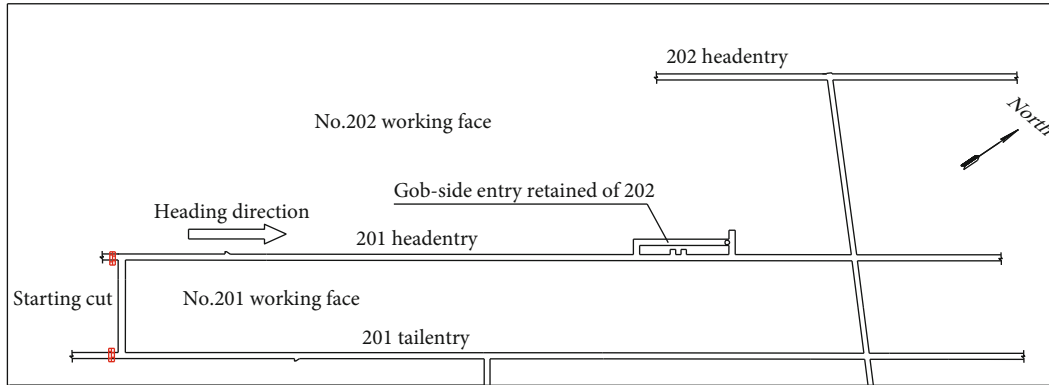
Schematic diagram of 202 gob-side entry retained test section.
